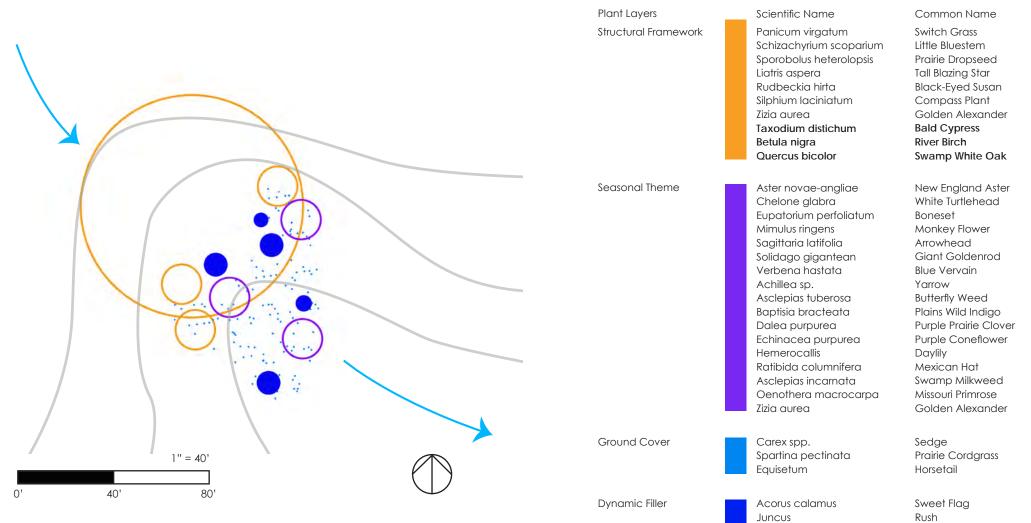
North Jardine Bioretention Site A Planting Plan and Palette.
